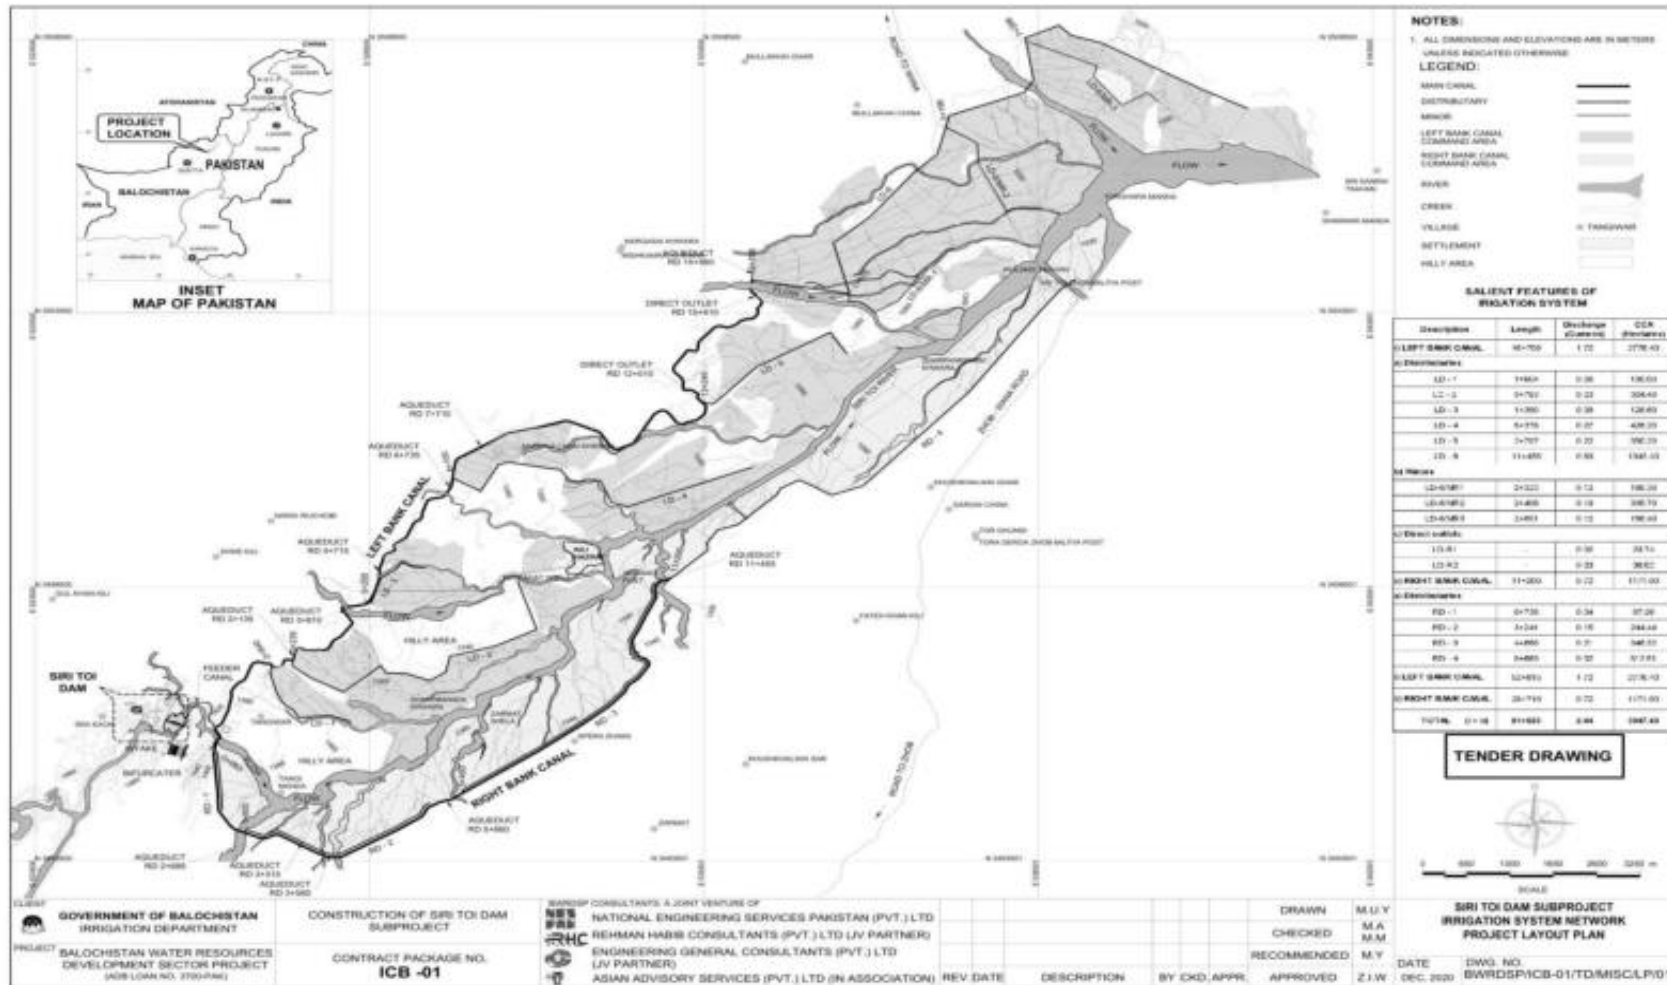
Siri Toi Dam Sub-Project and Irrigation System Network Project Layout Plan
